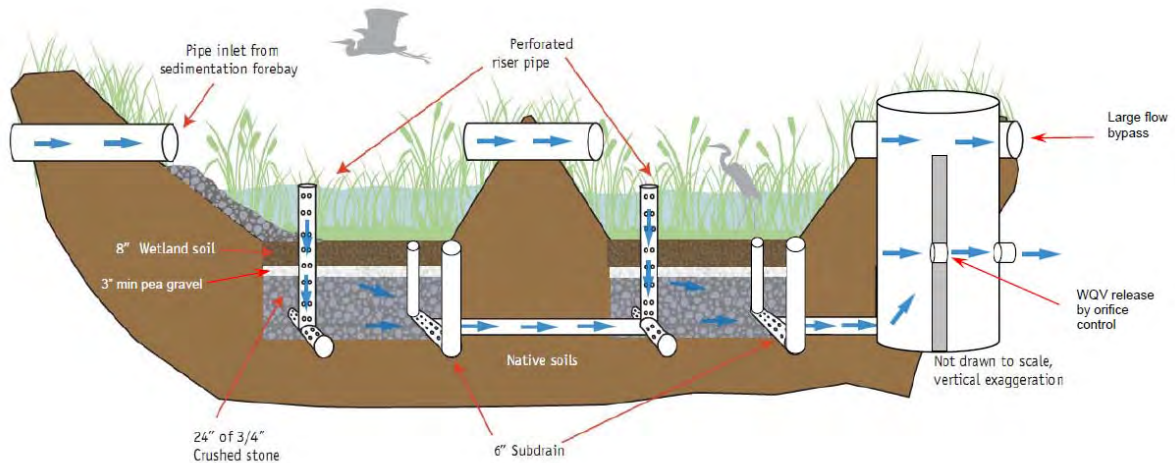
Gravel Wetland Cross-Section Concept Design (Credit: UNH Stormwater Center)
